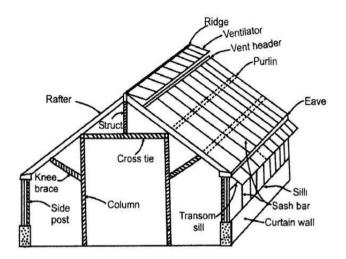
Pipe Framed Structures (Radha & Igatidnathane 2007, 14)
